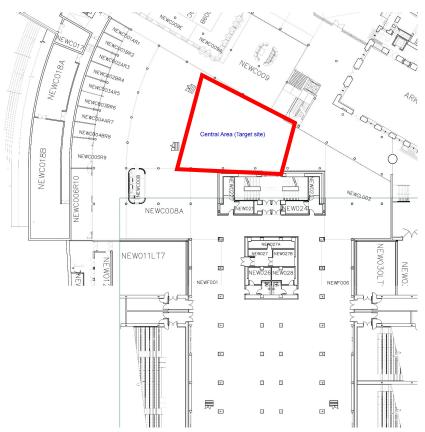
Basement floor of Newton Building Source: Nottingham Trent University, IT Team (2017)
